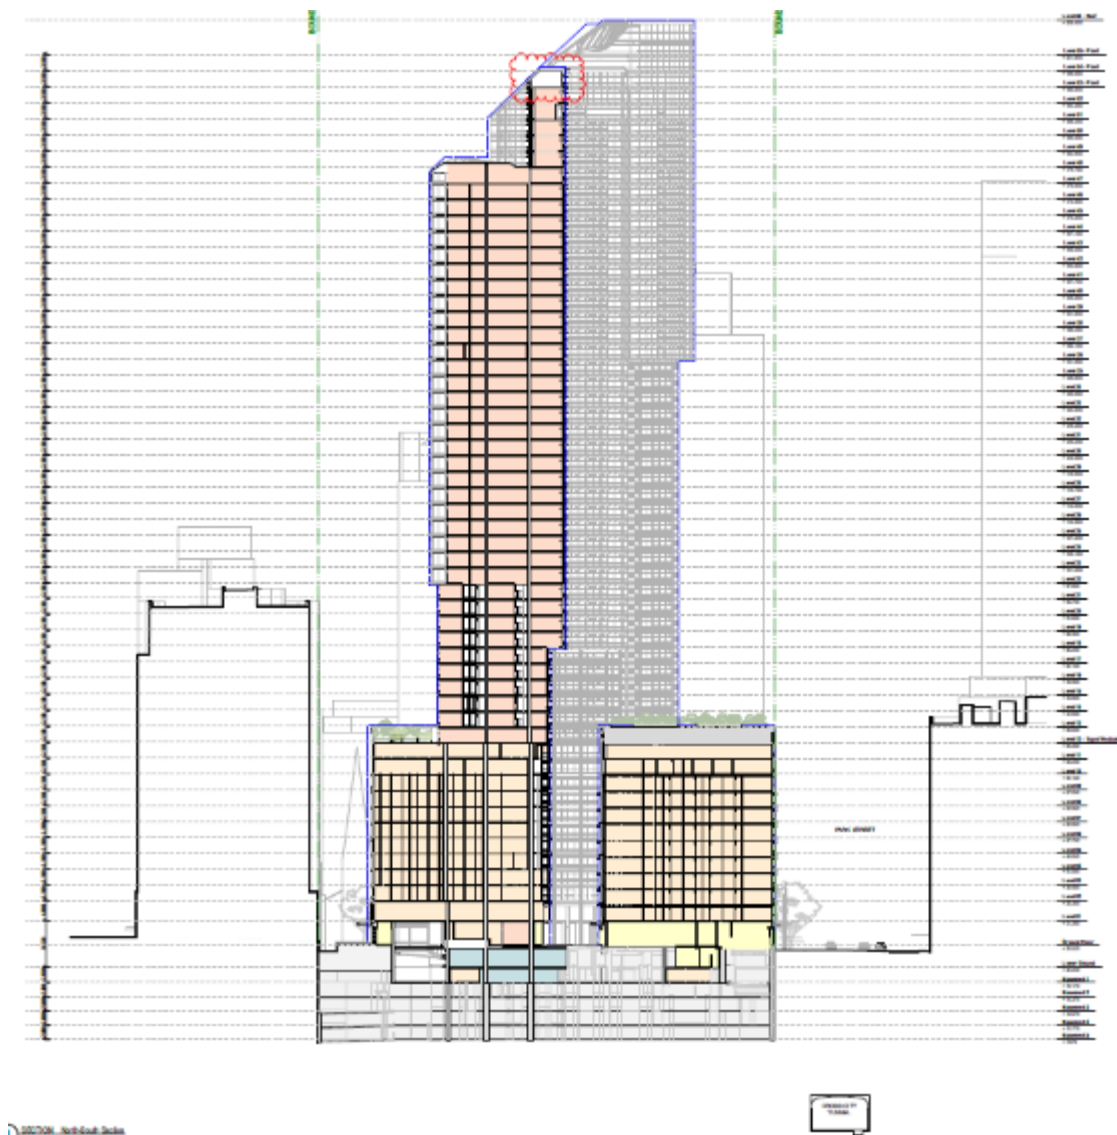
| Proposed section north-south (Source: Ethos Urban RtS amended architectural drawings)
